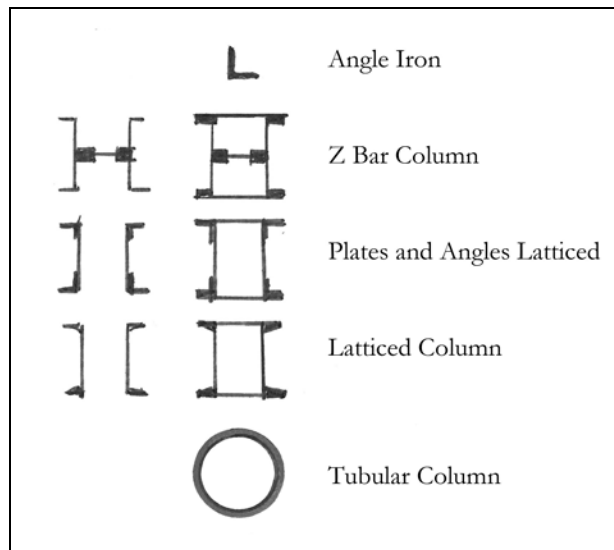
SUPPORT STRUCTURE LEG TYPES
